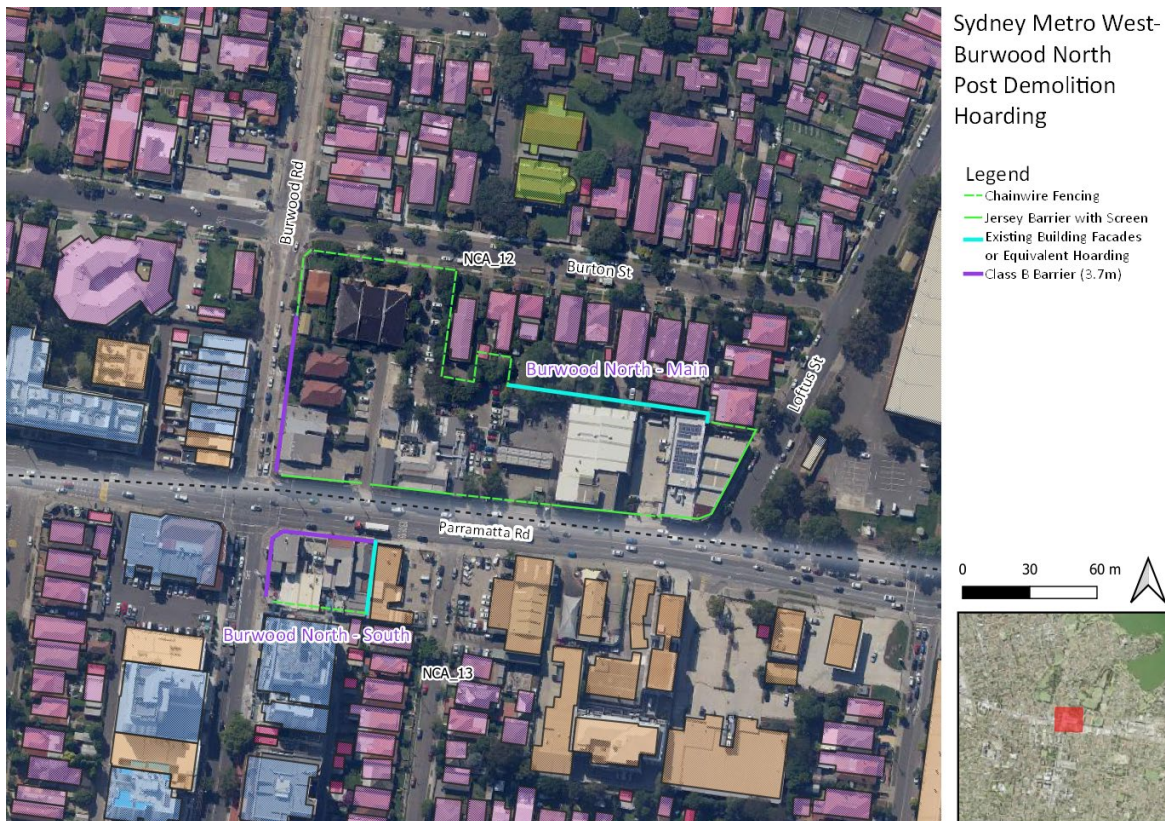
Hoarding layout – Post demolition, pre acoustic shed
